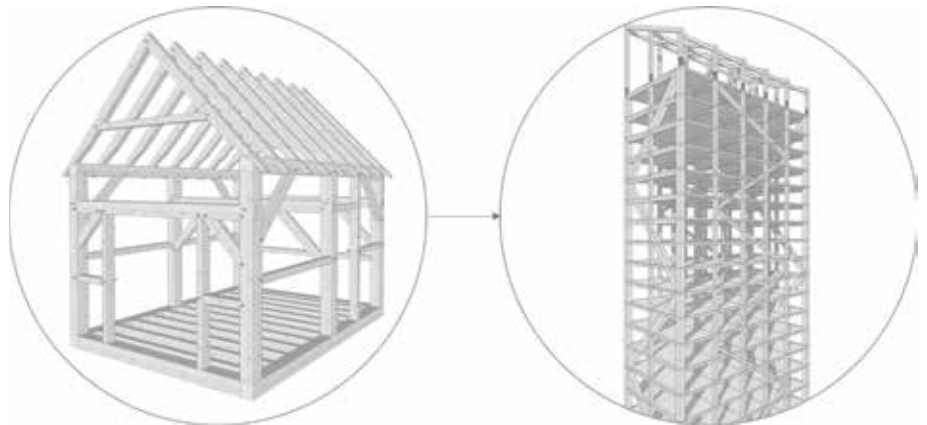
Principles used to construct single-family houses in timber framing have been transferred to modern high-rise structures, such as Mjøstårnet, the world's tallest all-timber building, in Brumunddal, Norway.
